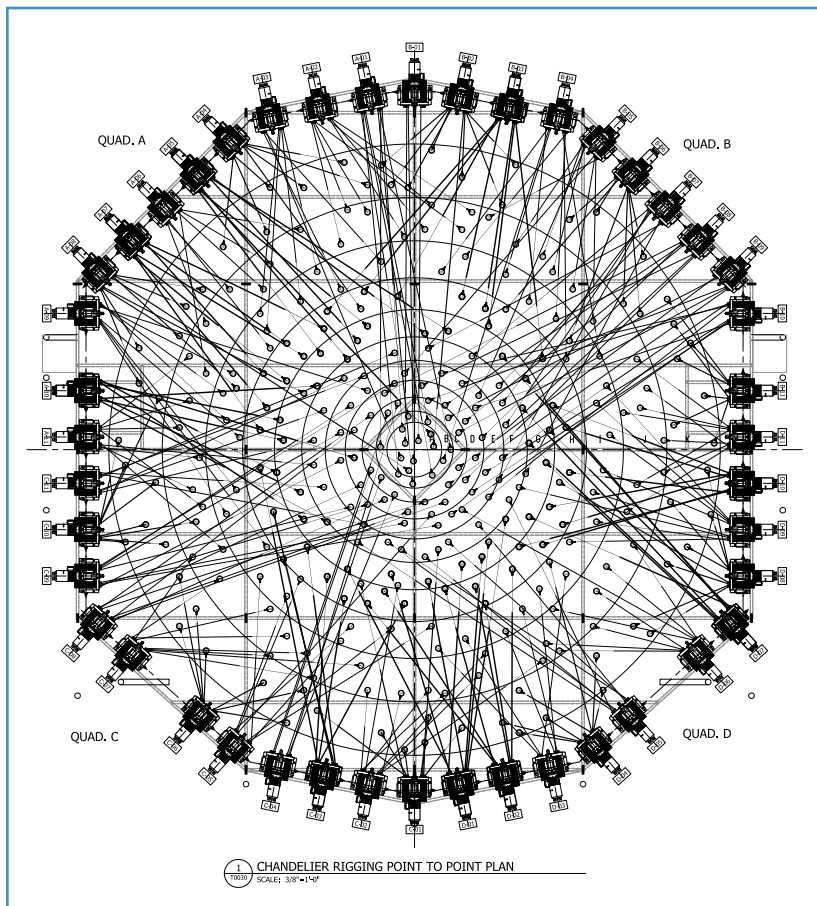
Hoist and cables grid layout. (Drawing courtesy of J.R. Clancy)
